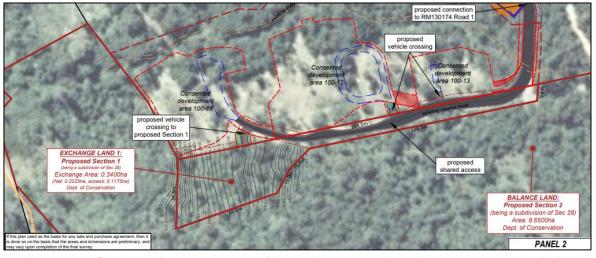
Excerpt from approved Paterson Pitts Group Subdivision Plan RM180302 showing the Part Section 28 approved to be subdivided off Section 28.
